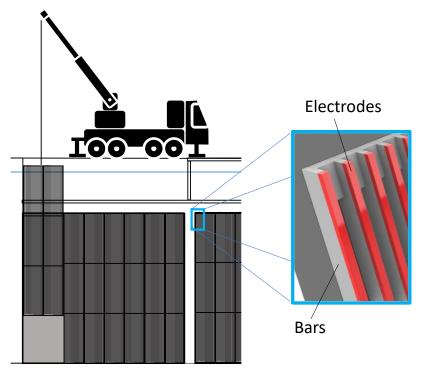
Concept study for a modular hybrid fish protection with a Bar Rack FishProtector at the intake/outlet structure of a pumped storage plant
